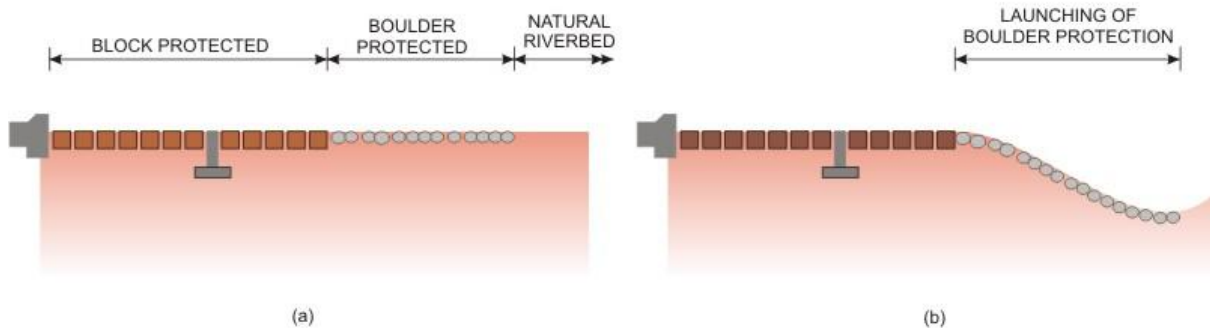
Section through downstream protection : (a) After initial laying ; (b) After scour of downstream riverbed due to passage of flood.
